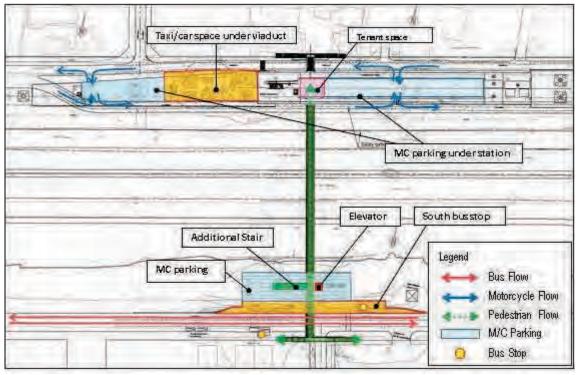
Concept Plan of the An Phu Station Area (upon UMRT opening)
